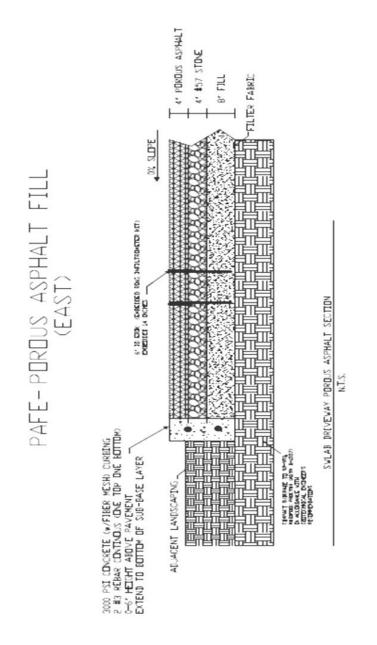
Cross-sectional view of Pervious Asphalt Fill (PAF)
